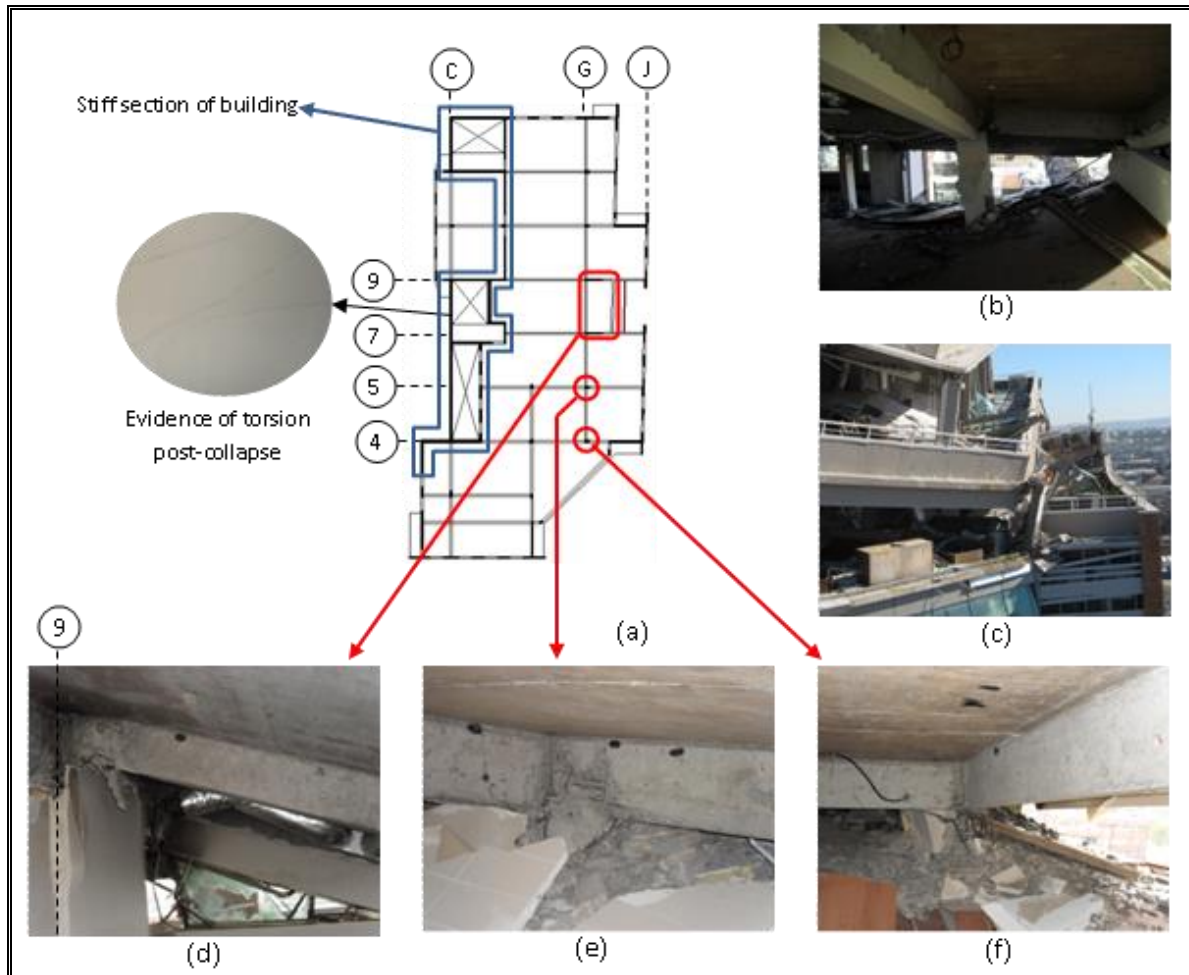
Building TO-9. (a) Structural plan of 12th story, (b) partial collapse of the 16th story, (c) partial collapse of the 20th story, (d) beams at 12th story, (e) column in axes G-5 of 12th story and (f) column in axes G-4.
